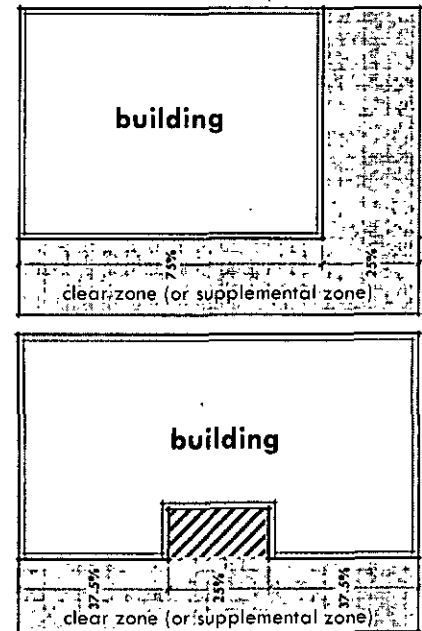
Examples of permitted building placement along core transit corridors. Parking is not permitted in the hatched area between the street-facing facade and the sidewalk.
